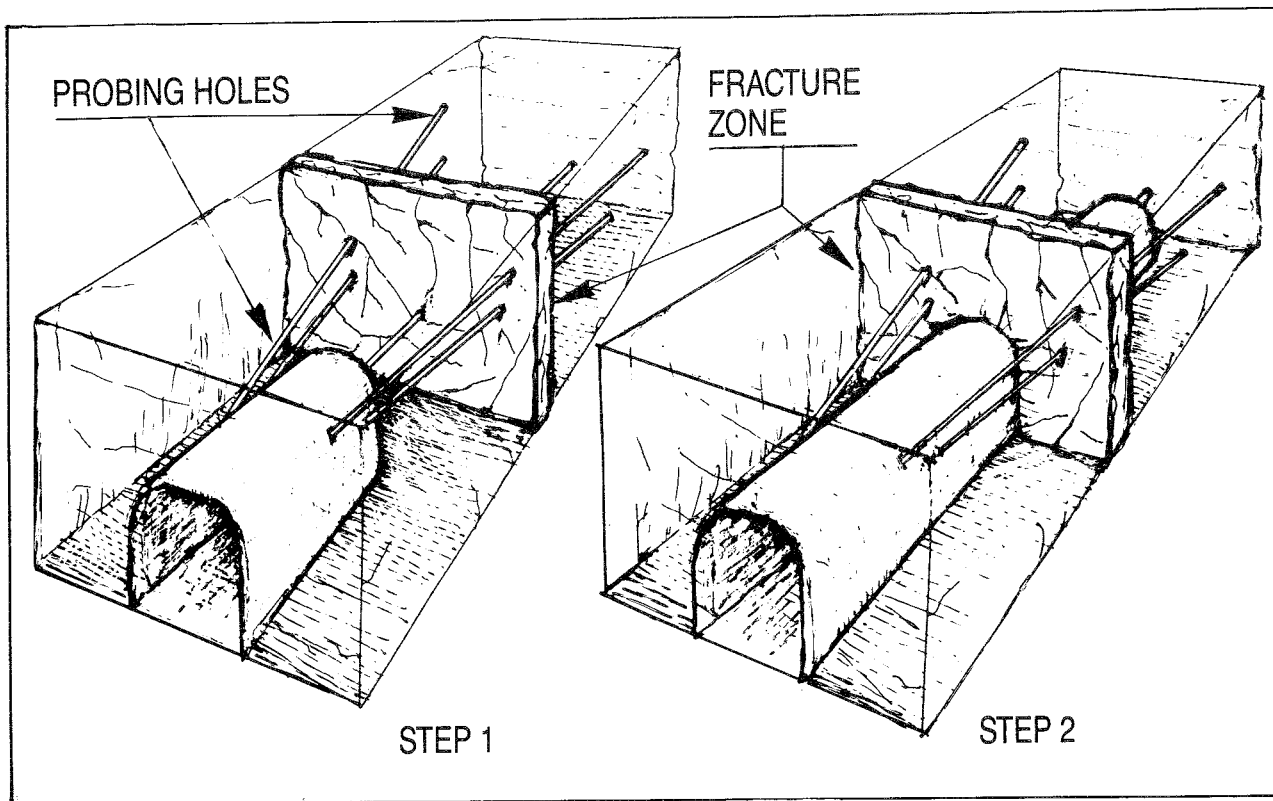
Planned probe holes in the side tunnels through an intersecting fracture zone.
